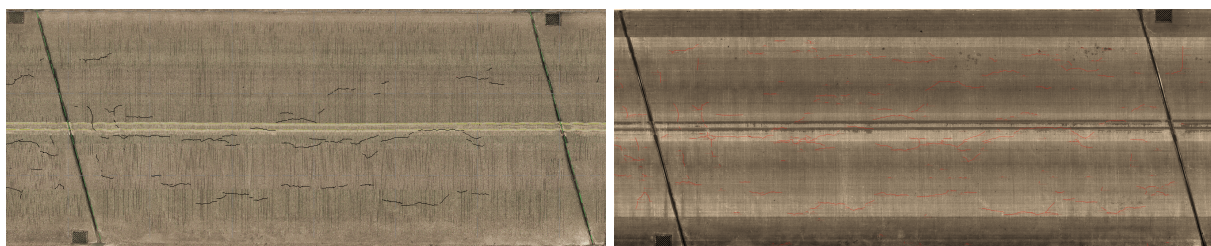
Existing Cracks of Bridge Deck No. 22387-Span 4
